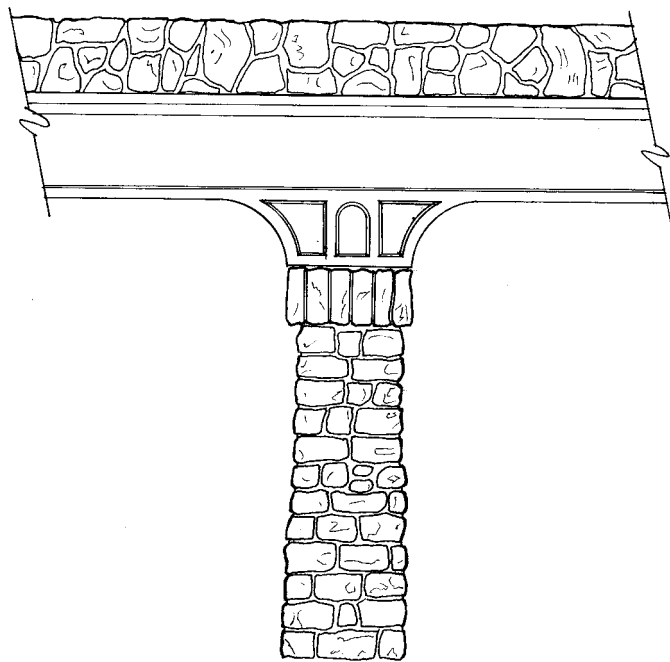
Bridge Pier and Railing with Cascadian Design Theme
